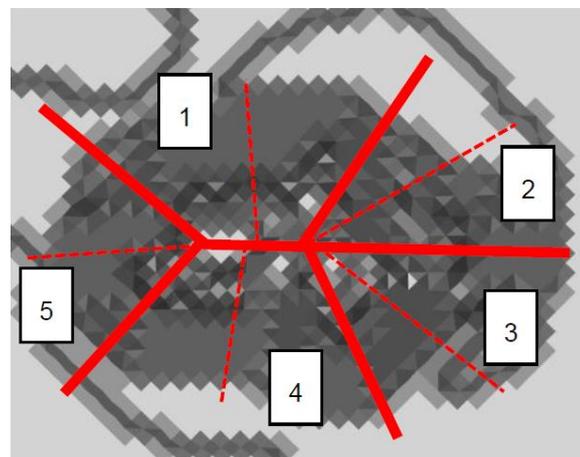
Sectors Defined in X1 Typical Pit and the Sections for the Stability Analysis.
